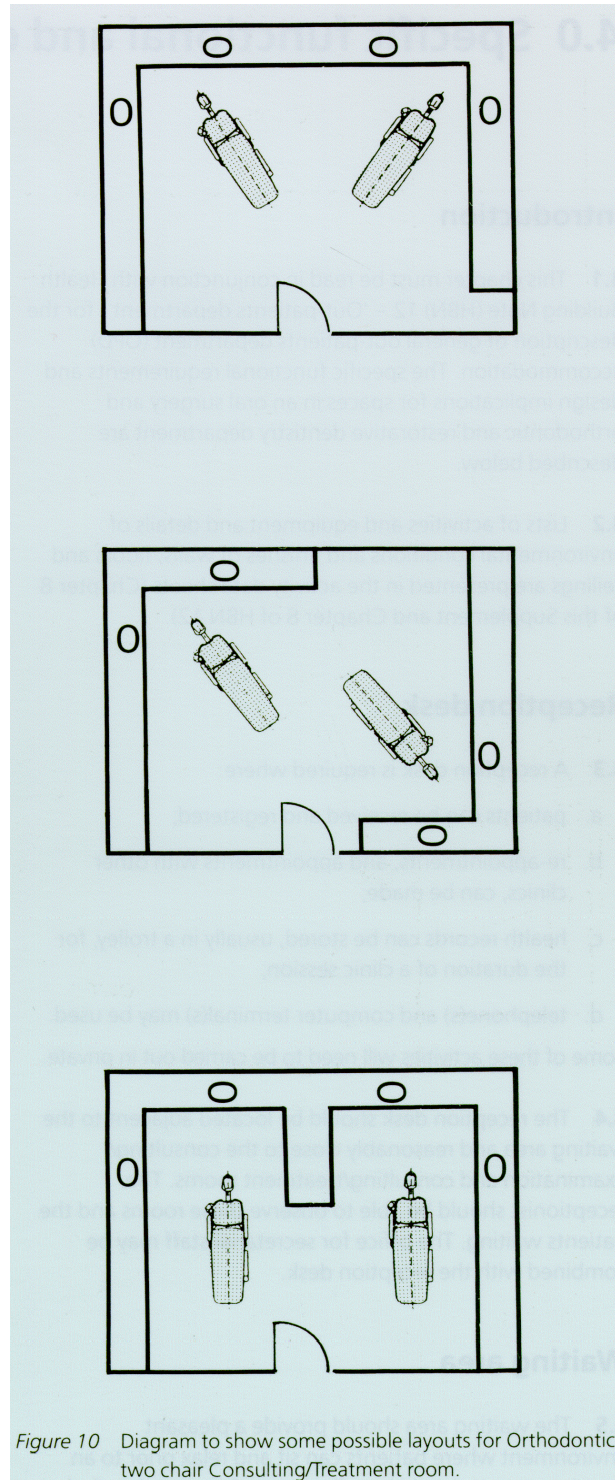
Diagram to show some possible layouts for Orthodontic two chair Consulting/Treatment room.
